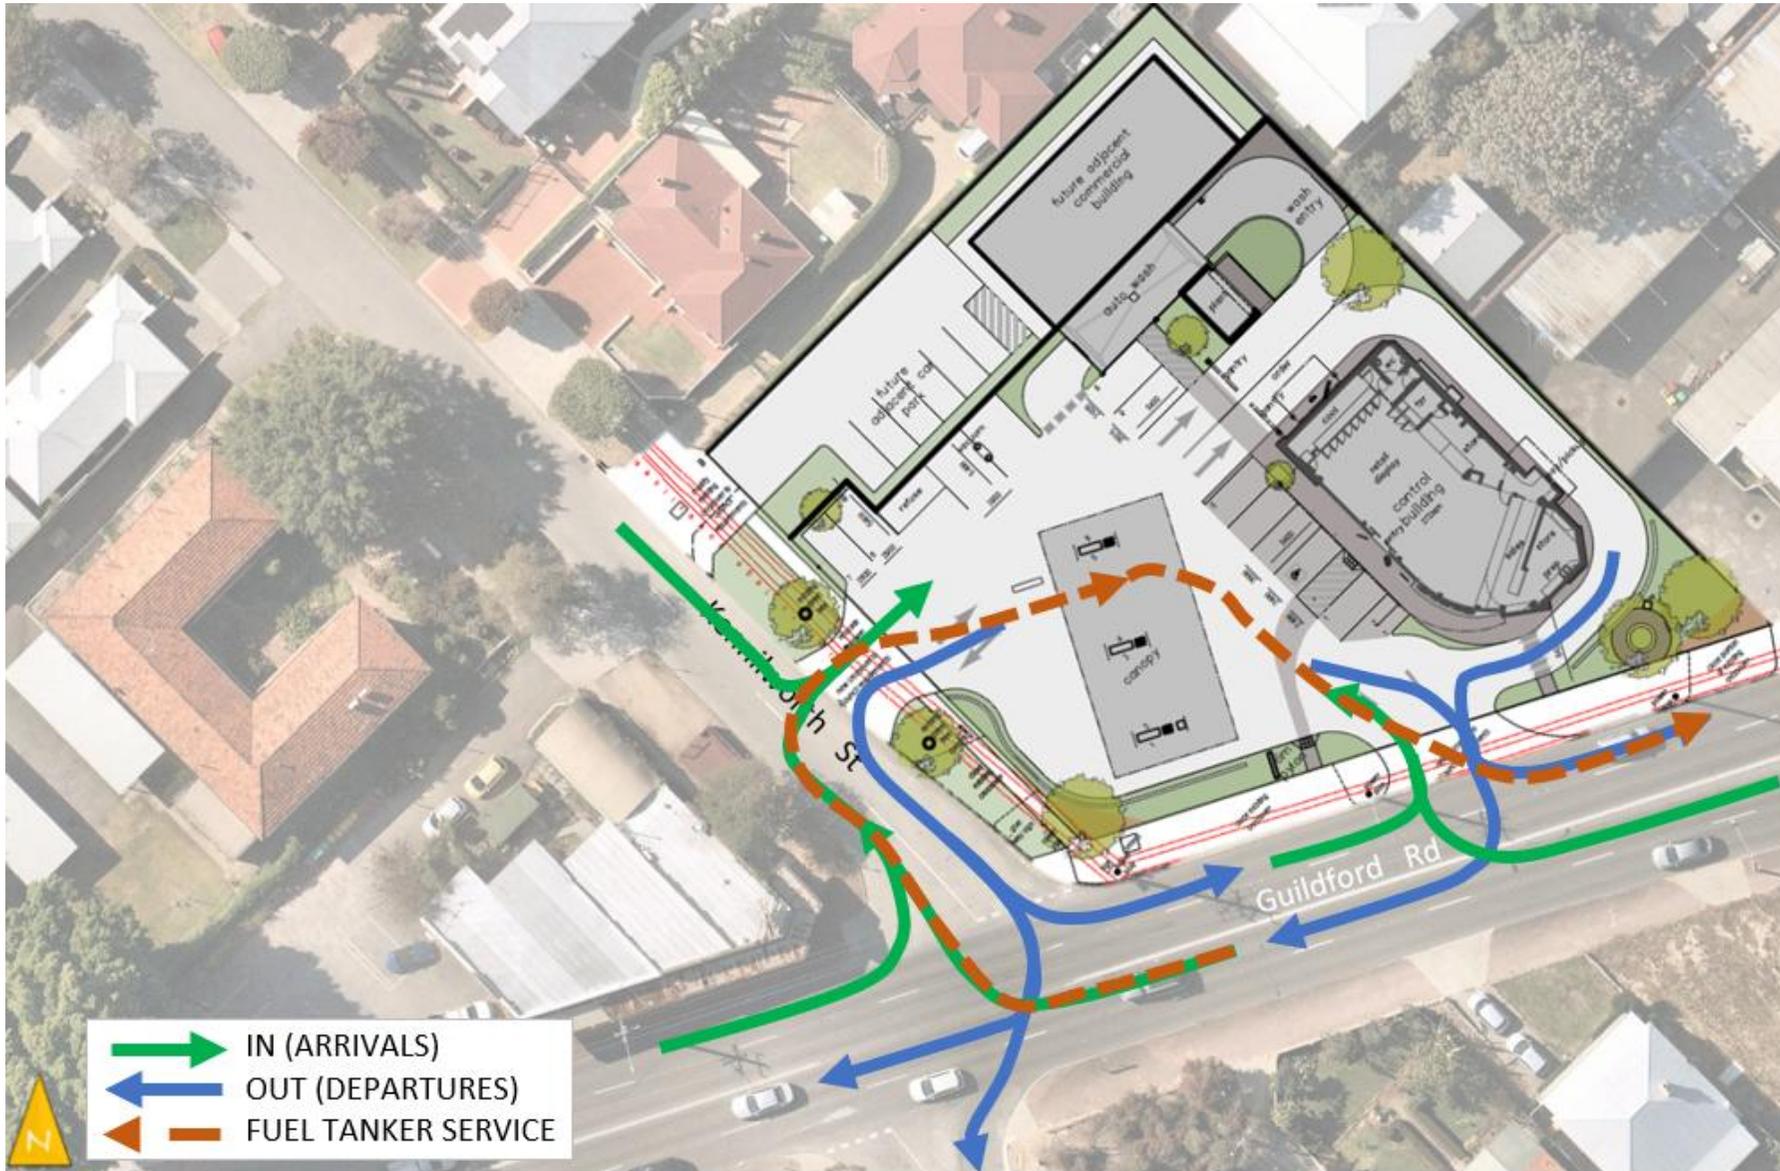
Arrival & Departure Routes dictated by the proposed access driveways and restrictions with existing layout
